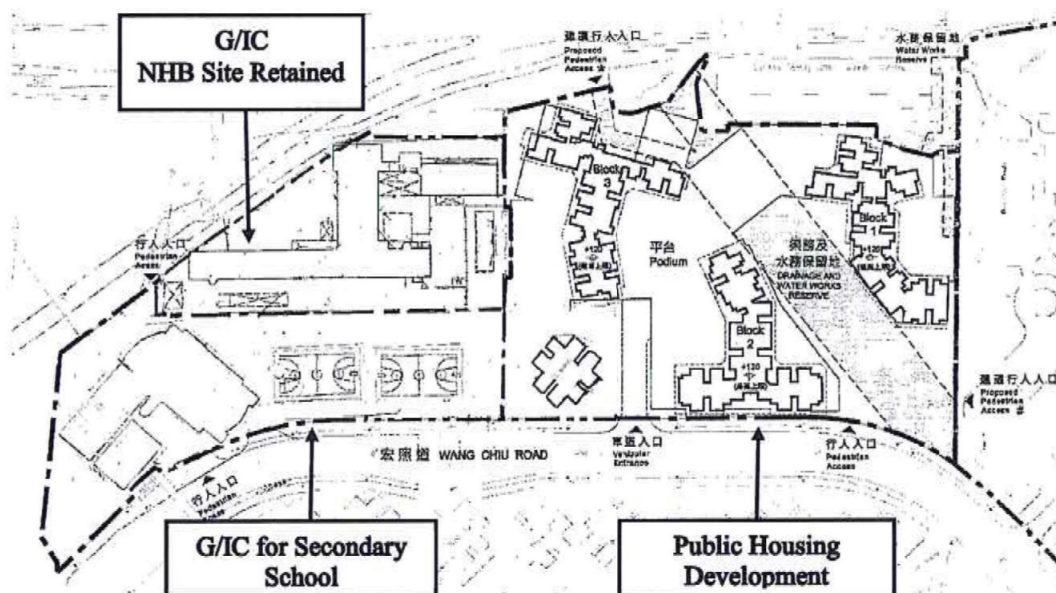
Indicative Layout Plan of the Alternative Option for WCR Site
